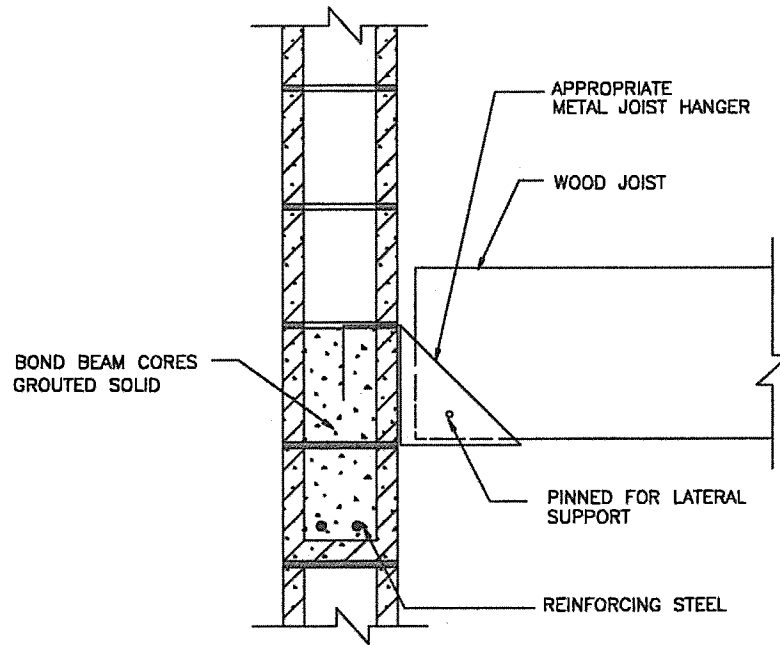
Load Bearing Masonry Wall With Wood Joists
